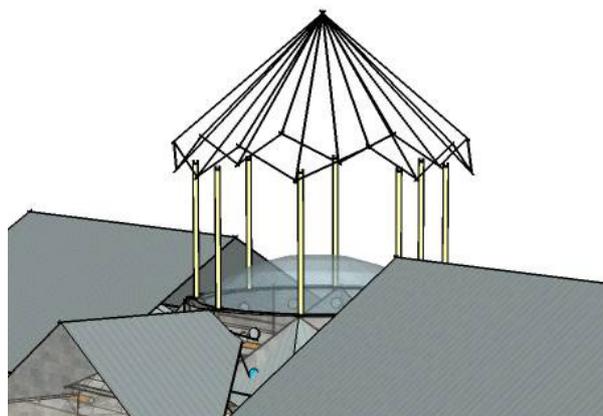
The proposal for a new lantern, only made of a steel light skeleton
